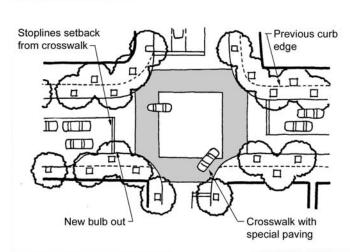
Plan of intersection at Prospect and Springfield Avenue, Maplewood, N.J.
